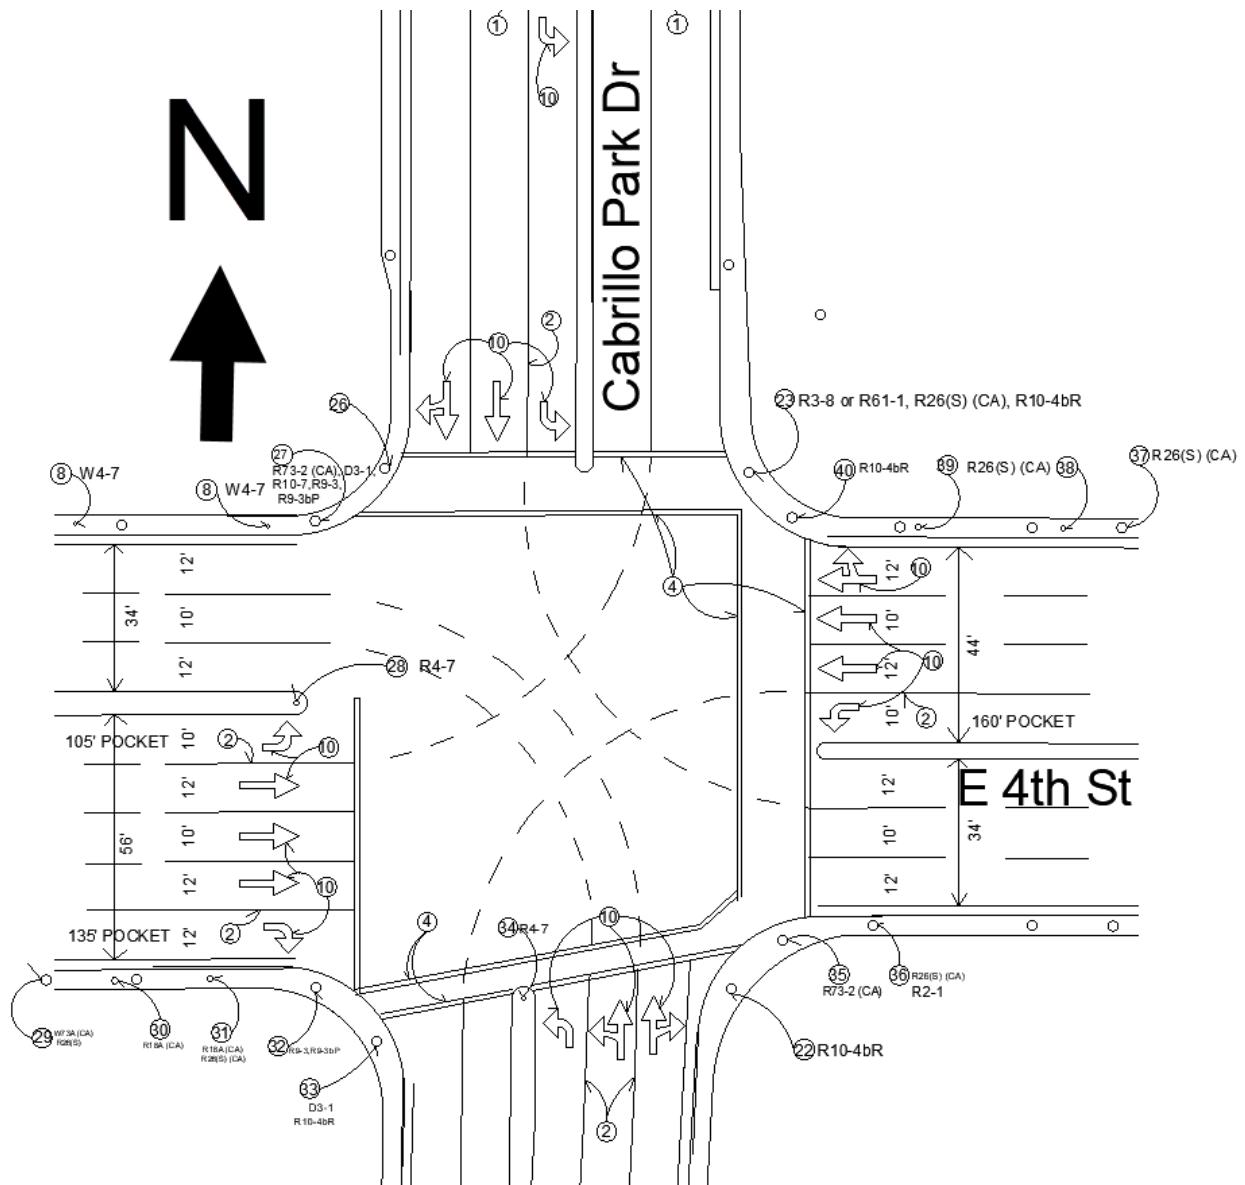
Proposed Street Improvements - Cabrillo Park Drive & E 4th Street
